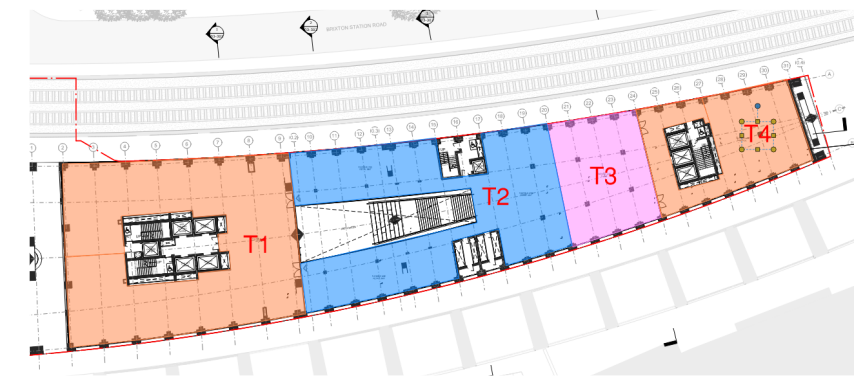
Metering boundary for Office, retail and community tenant at First Floor
